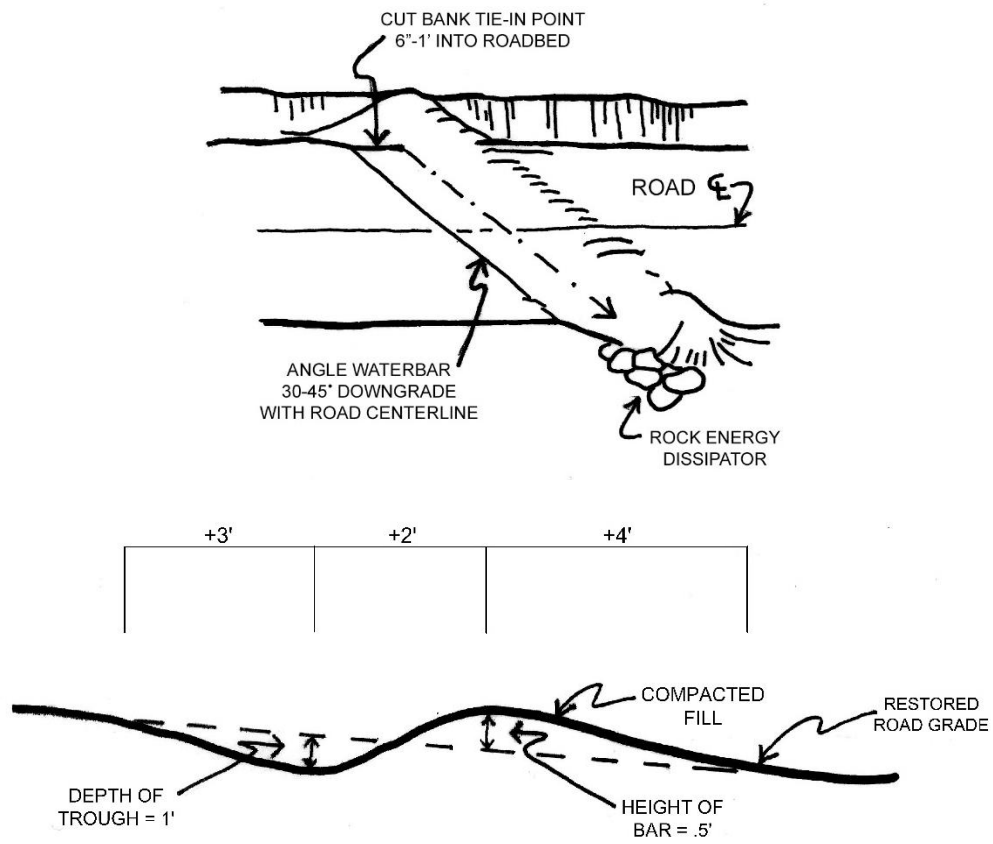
Plan View (top) and Cross Section (bottom) of a Waterbar
